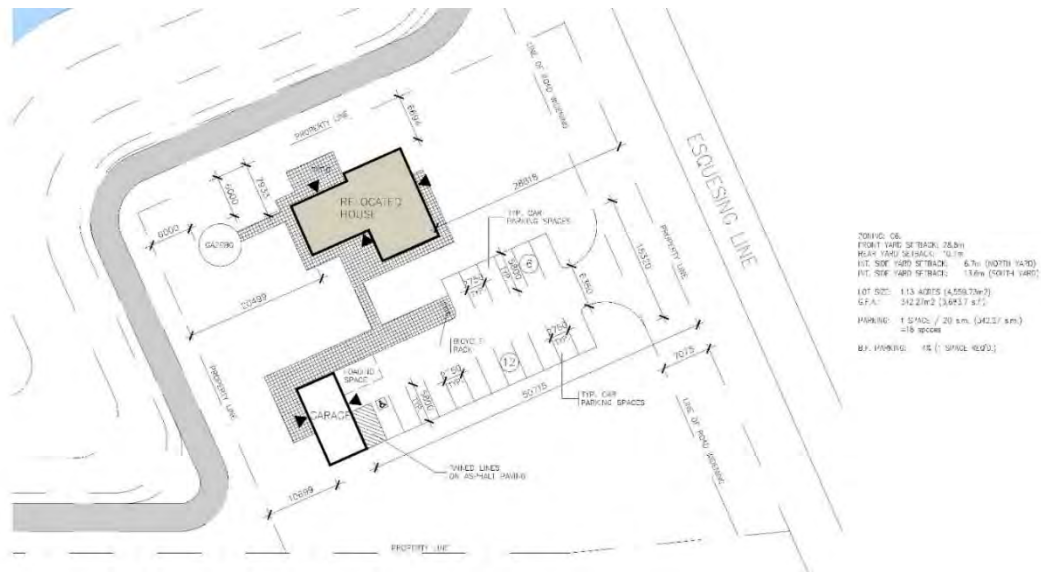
Conceptual Site Plan showing new proposed parcel for heritage house relocation (Orlando Corporation, August 2021)
